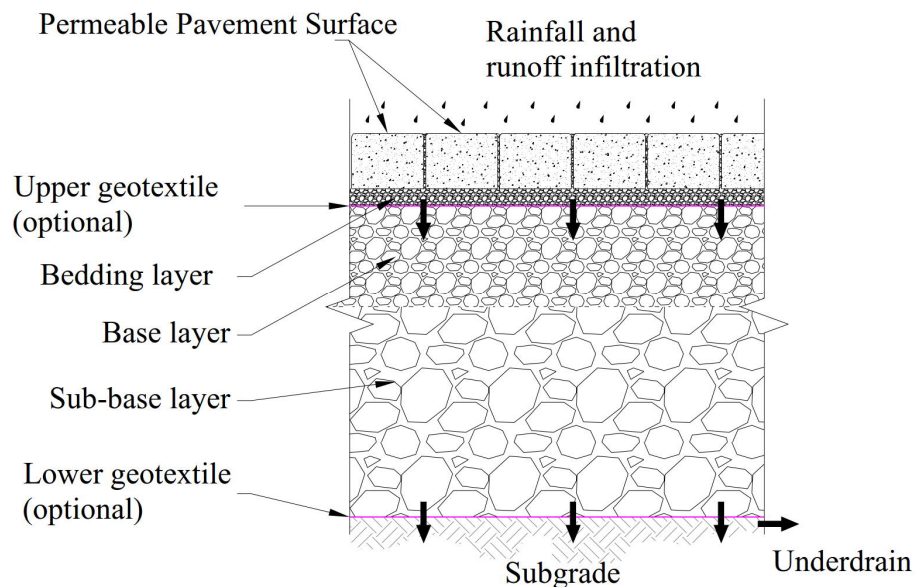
Cross section schematic of a permeable pavement system with geotextiles
